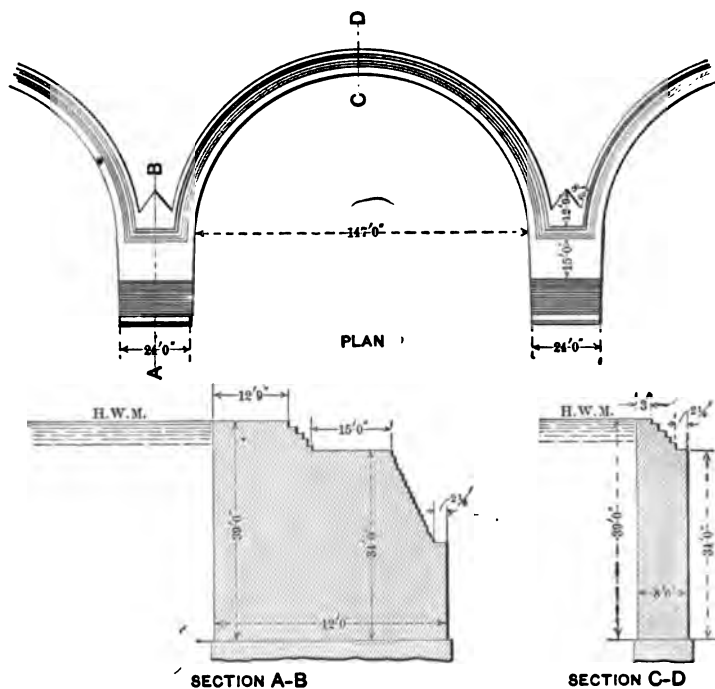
Meer Allum Dam, India. Plan and Sections of One Arch.
